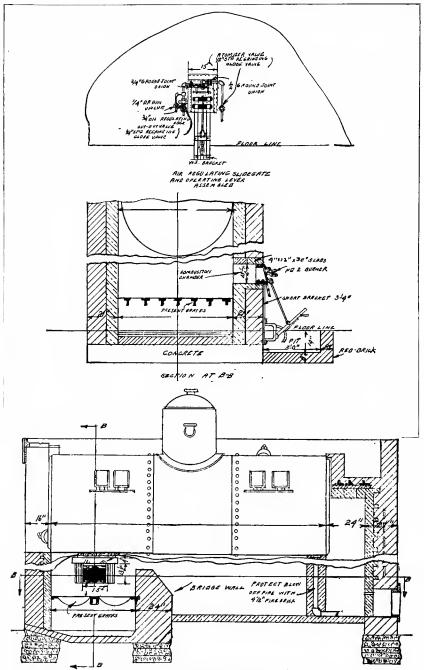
Liquid fuel injecting apparatus applied to a horizontal return tubular boiler.
